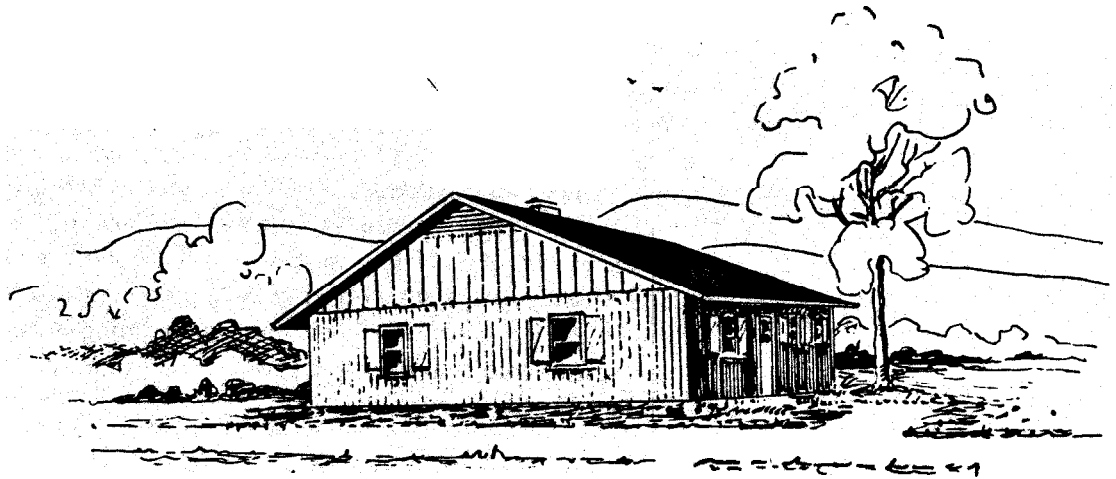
Two-bedroom house on wood-post foundation from plan FS-FPL-5 modified for a vacation house. Built by owner with a materials cost of \$2,300, exclusive of heating, plumbing, or electrical systems.
